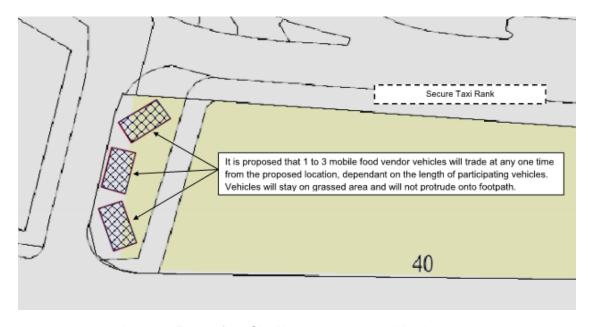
Excerpt from Site Plan as submitted 30 March 2016.
